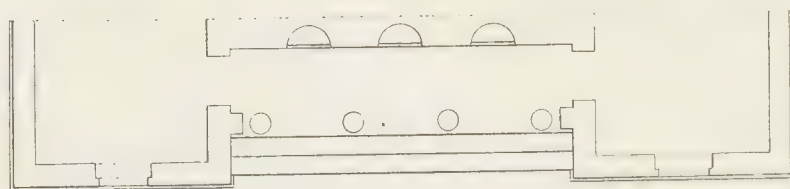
Plan of the Gatehouse, showing the internal arrangement of the rooms.
